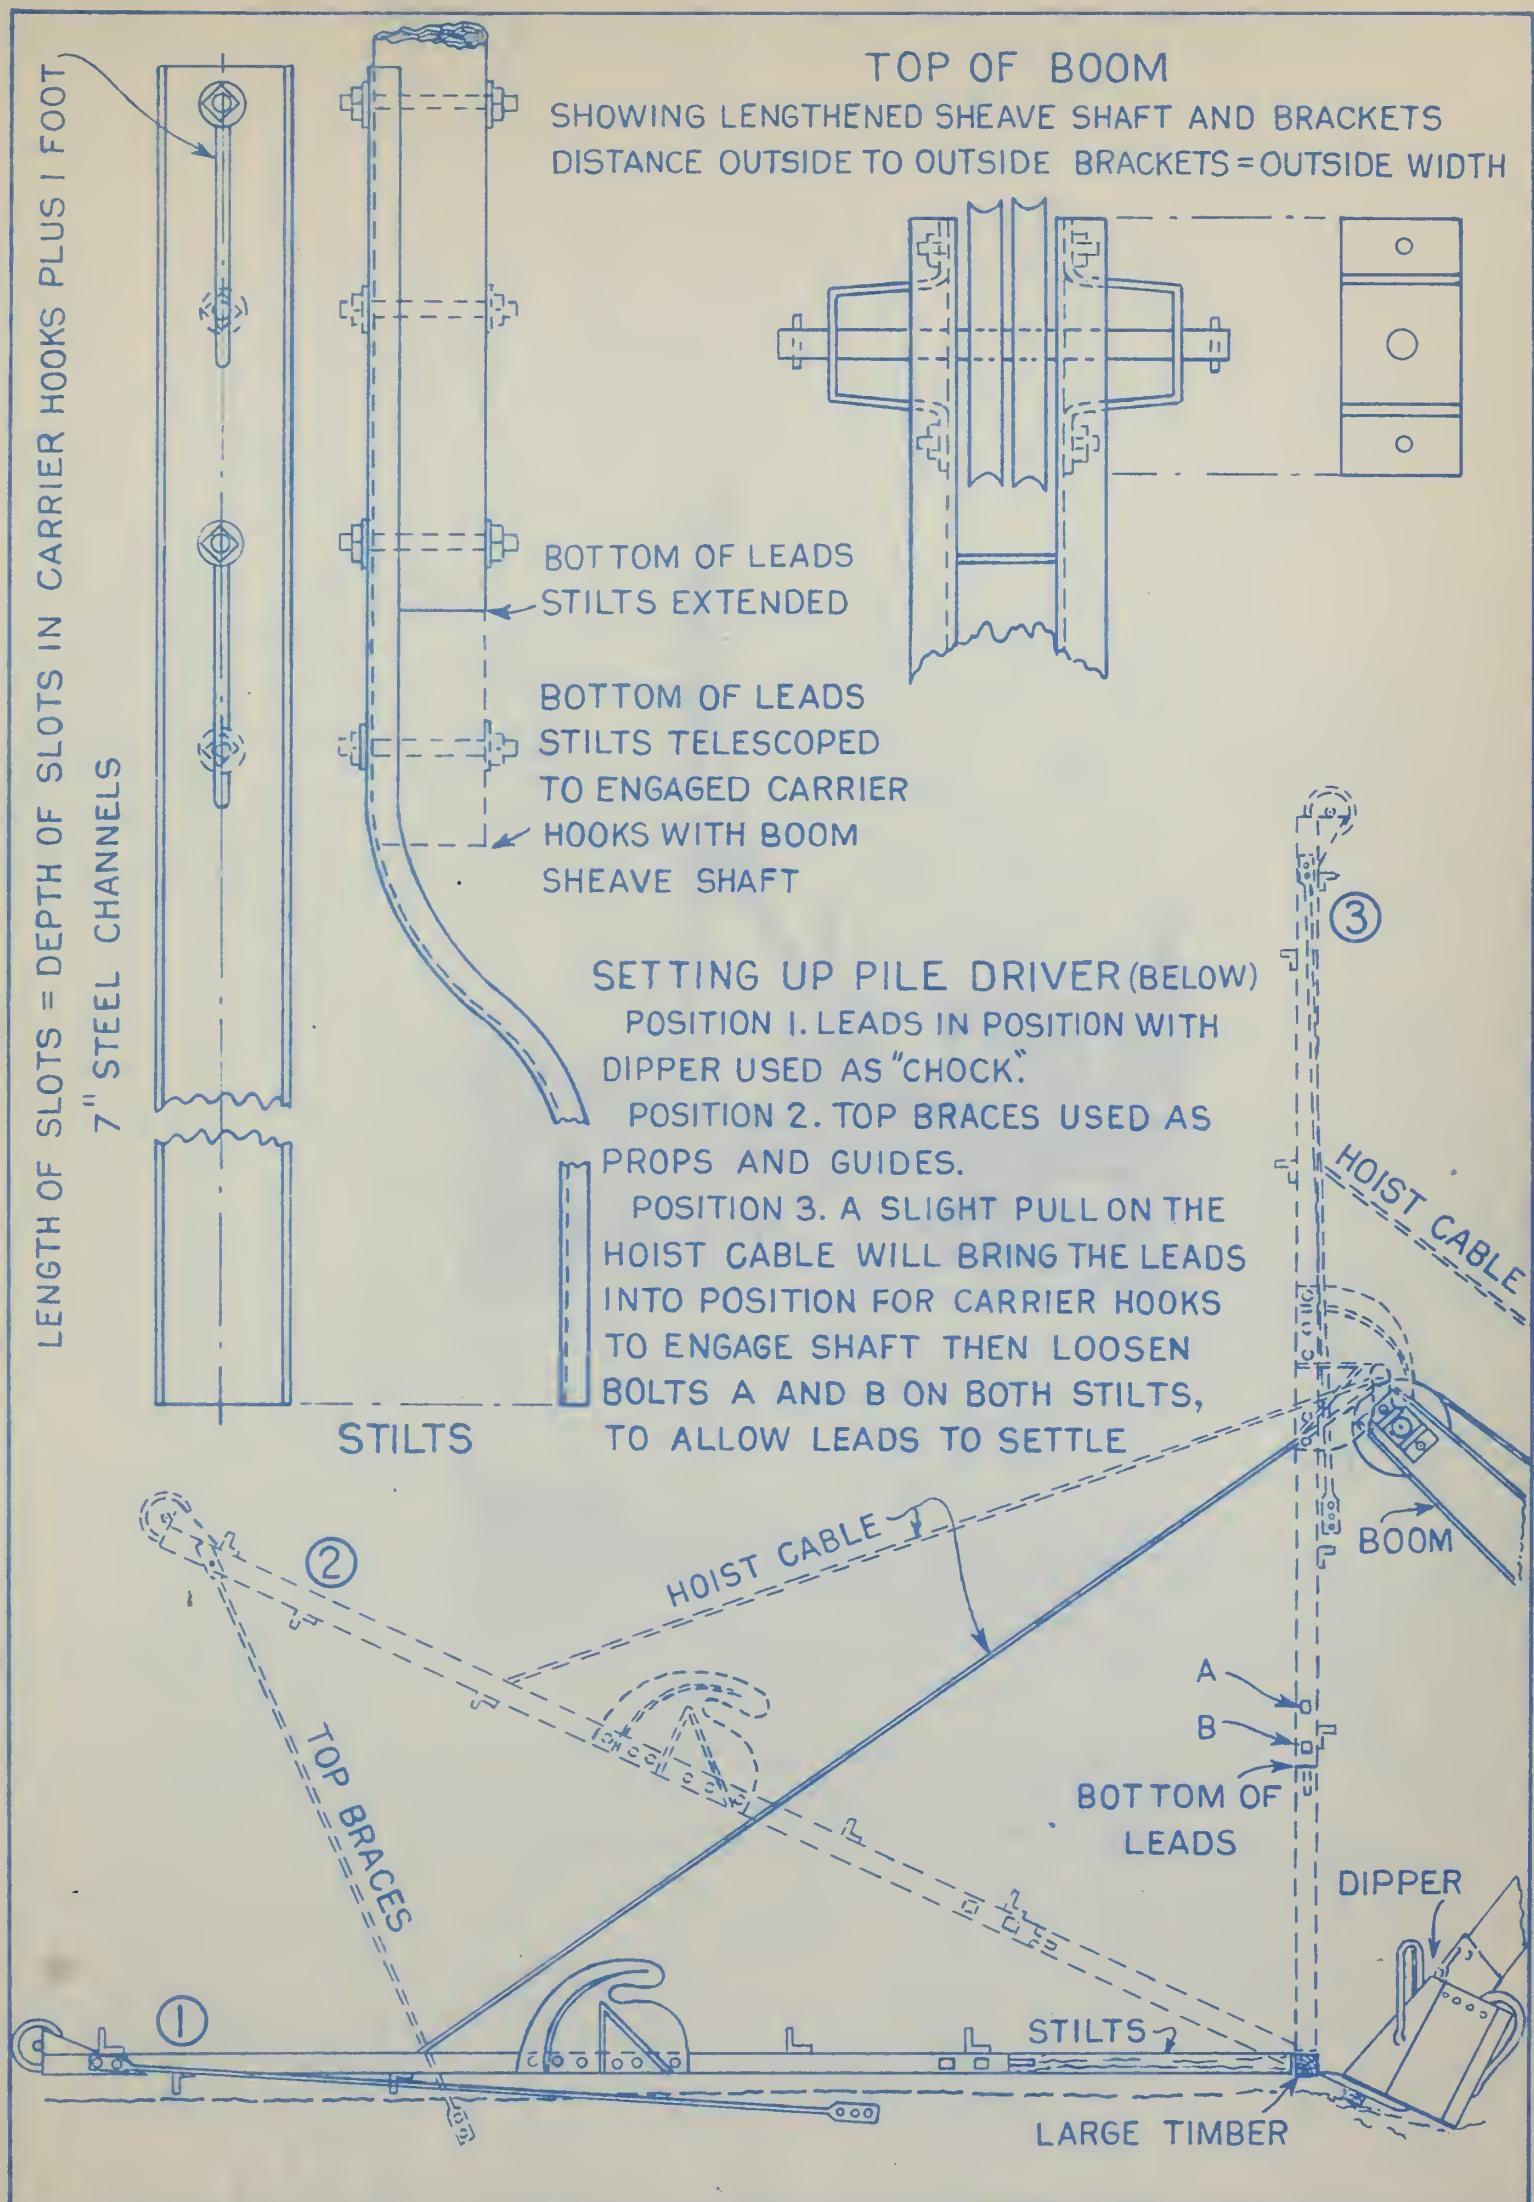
FIGURE I - DETAILS OF IMPROVISED PILE DRIVER ATTACHMENT FOR A STEAM SHOVEL
